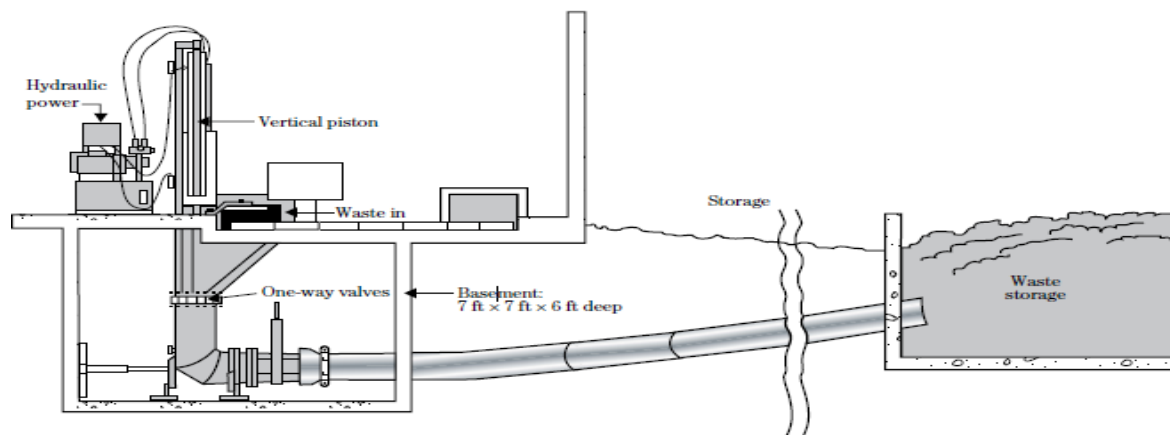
B Vertical piston plunger waste pump with a pipe anchor
